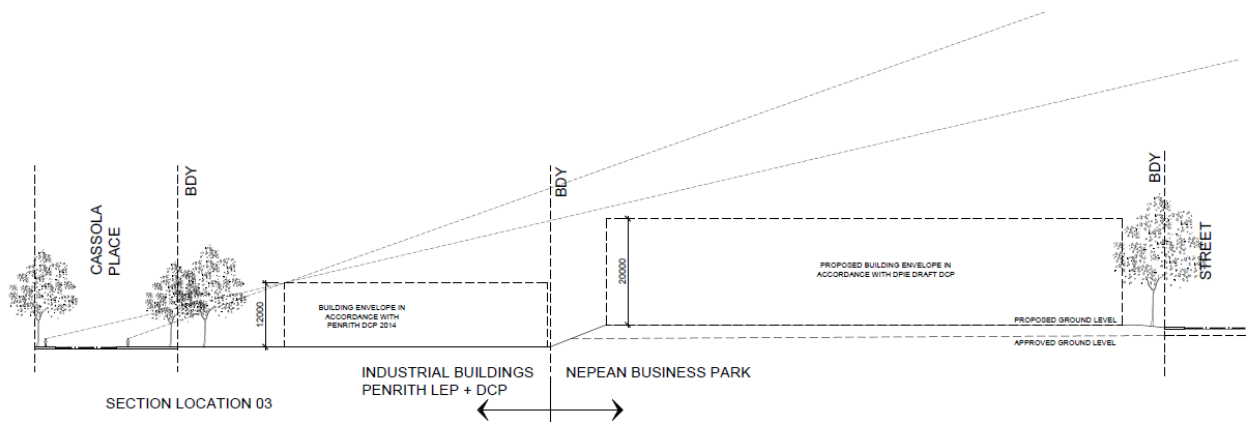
Section (Location 03) showing ground levels and viewlines in relation to adjoining industrial sites on Cassola Place (Source: MCHP Architects)
